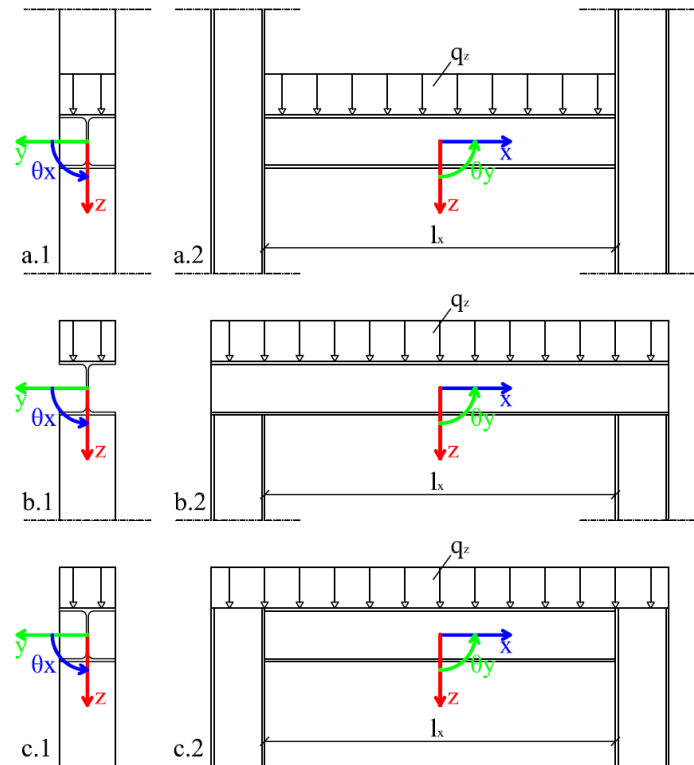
a: Typical beam-to-column floor layout¹, b&c: Typical beam-to-column roof layout¹
